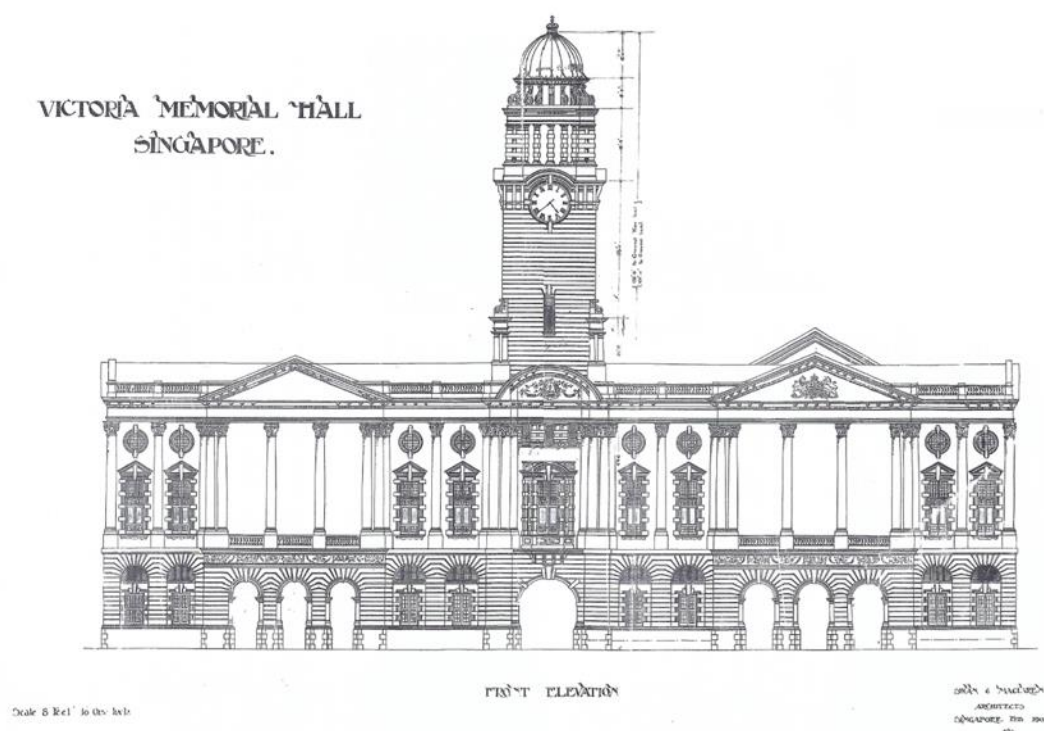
Swan & Maclaren. Front elevation of the Victoria Memorial Hall, Singapore, 1908. NAS CBS 122, Building Plan 6850.
